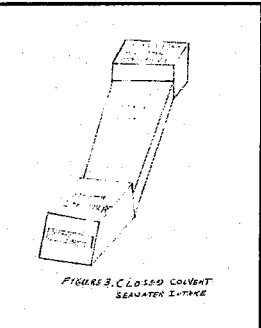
, CLOSED CULVERT SEAWATER INTAKE
